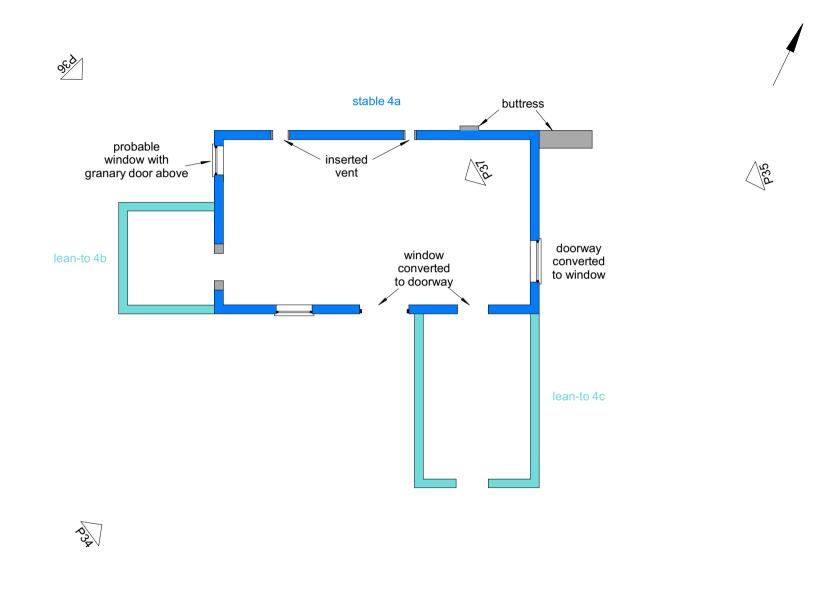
Structure 4, floor plan showing location and orientation of photographs included in the report.
